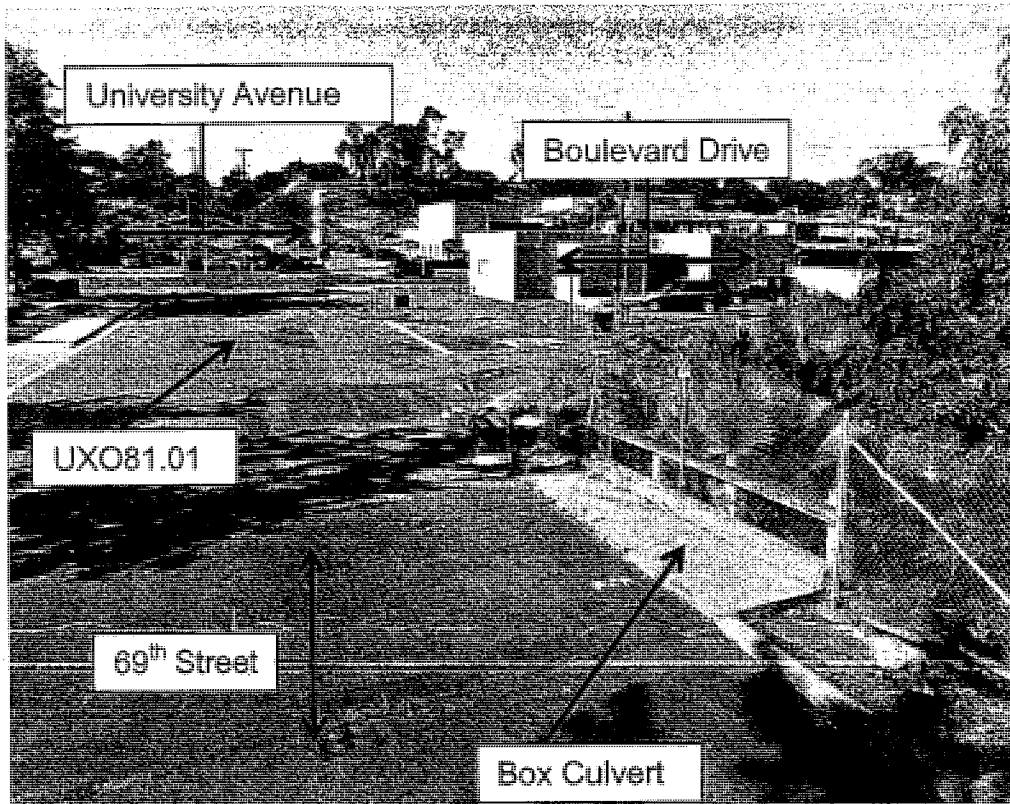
Manhole UX081.01 at intersection of Boulevard Dr. and 69th St.
